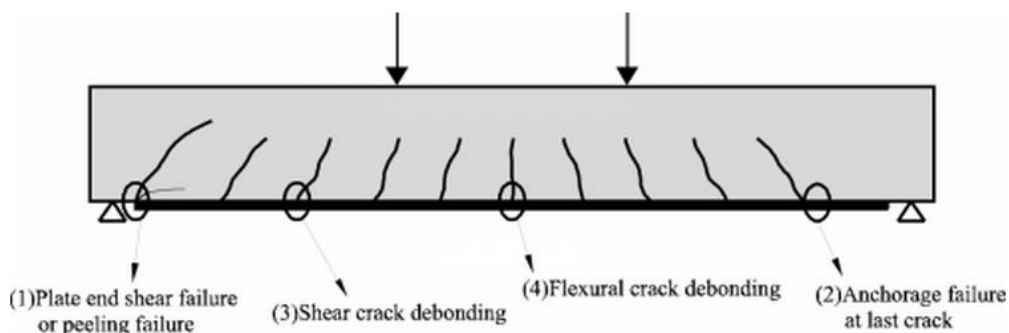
Debonding failure modes of FRP strengthened RC beams (Aram et al. 2007)
